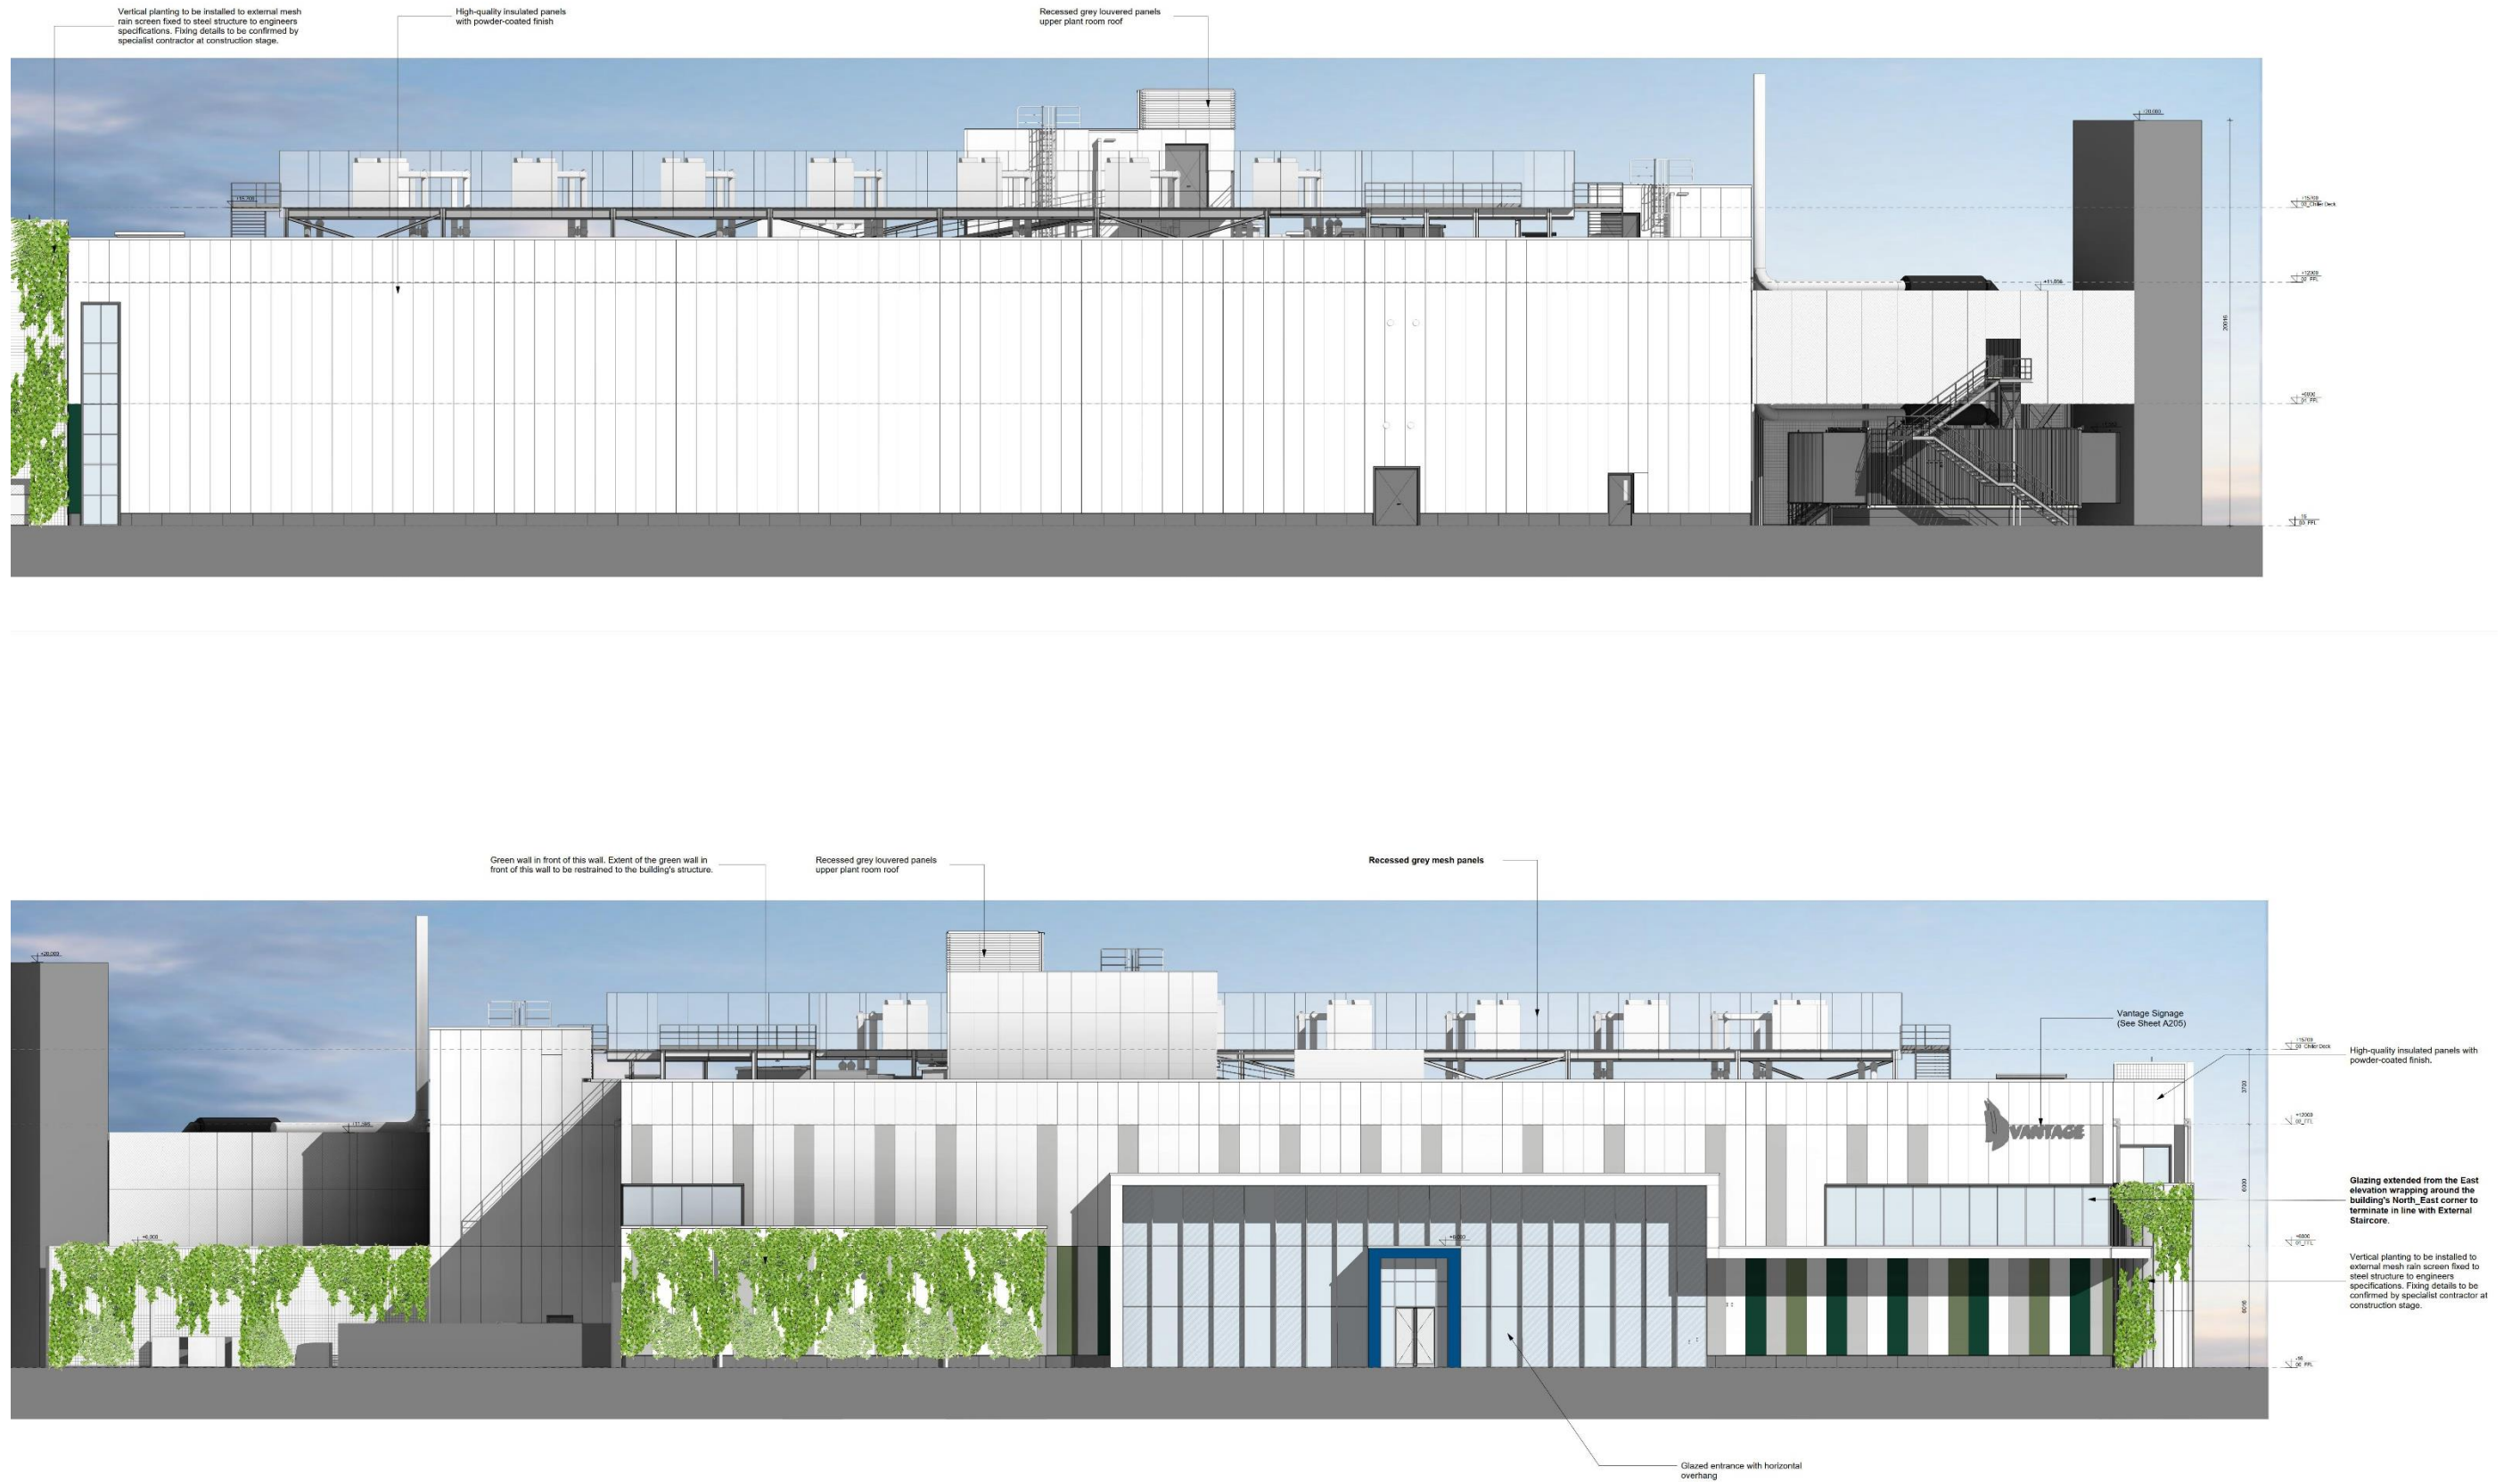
R: DUB-13 East and West Elevations (Source Burns & McDonnell)
